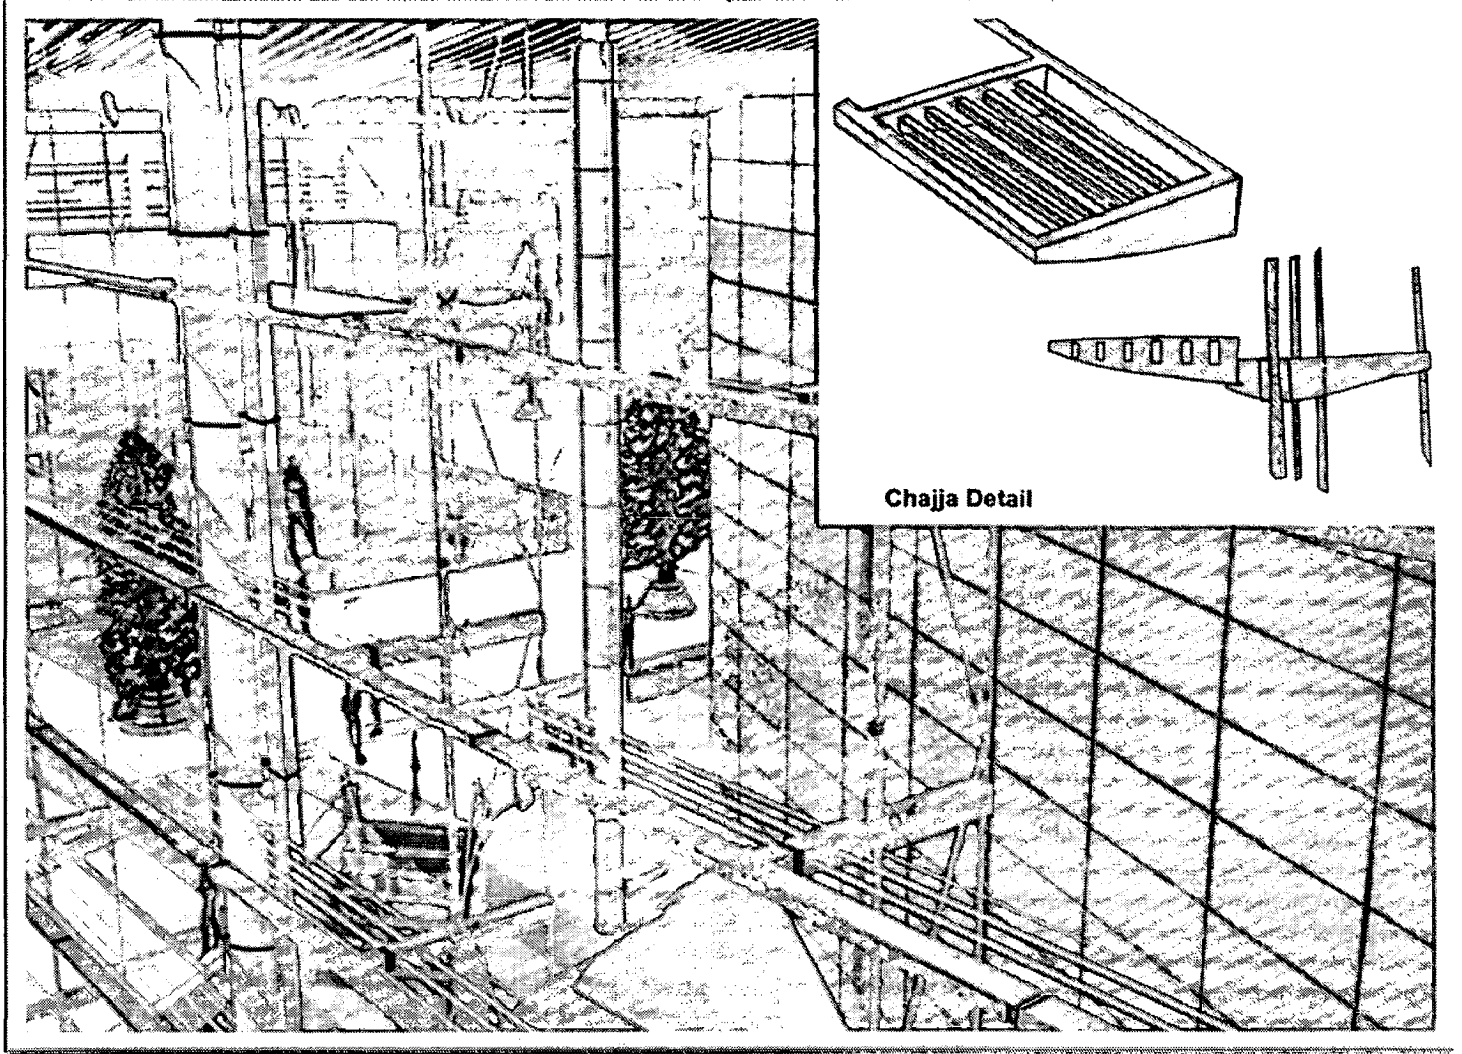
A view from ceiling height into the auditorium foyer. Detail showing specially designed chajjas for the building. These were planned to be provided on the external face of the building to block sun rays. Structure shown is in steel, Aluminum and glass partition are provided for segregation of spaces.
